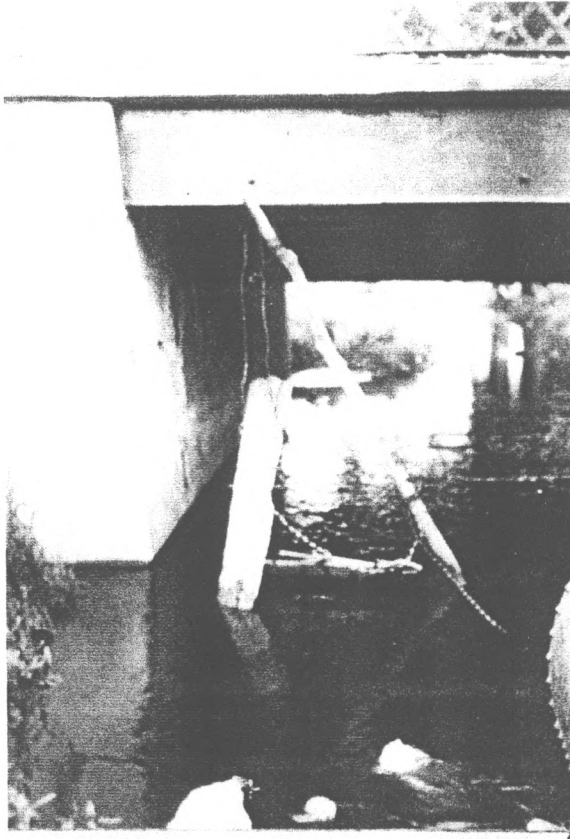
Pre-existing Diamond Bridge Avenue Bridge (photo taken ca. 1931), showing line of proposed walkway. Note height above water line, iron stringer, metal lacing infill on railing. Source: Olmsted Brothers National Historic Site, Brookline, MA
